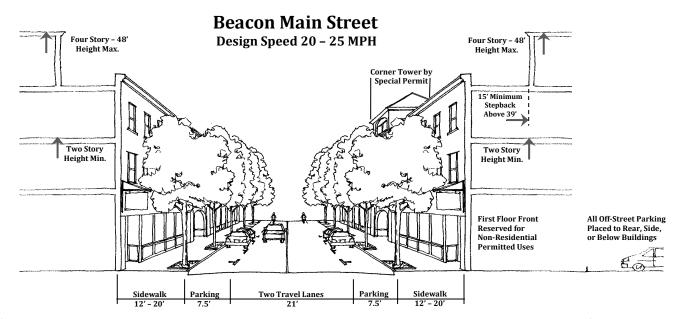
Central Main Street Zoning Requirements Illustrative View
